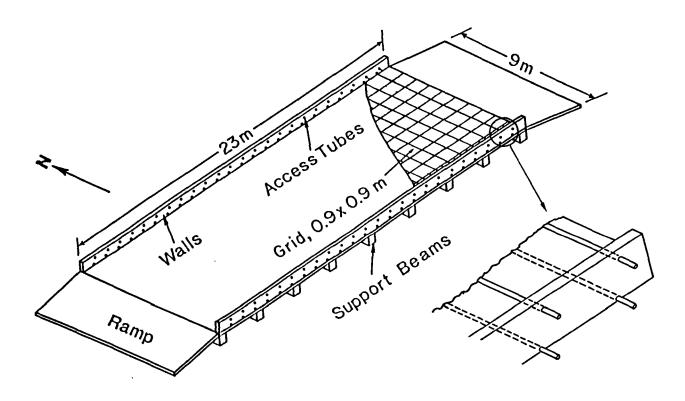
Clay liner testing facility, similar to Figure 4.1 but in SI units showing additional detail on horizontal access tubes.
